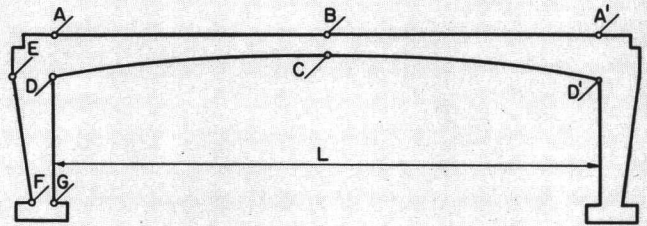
Outline of a typical single-span, solid-deck, rigid-frame bridge.
